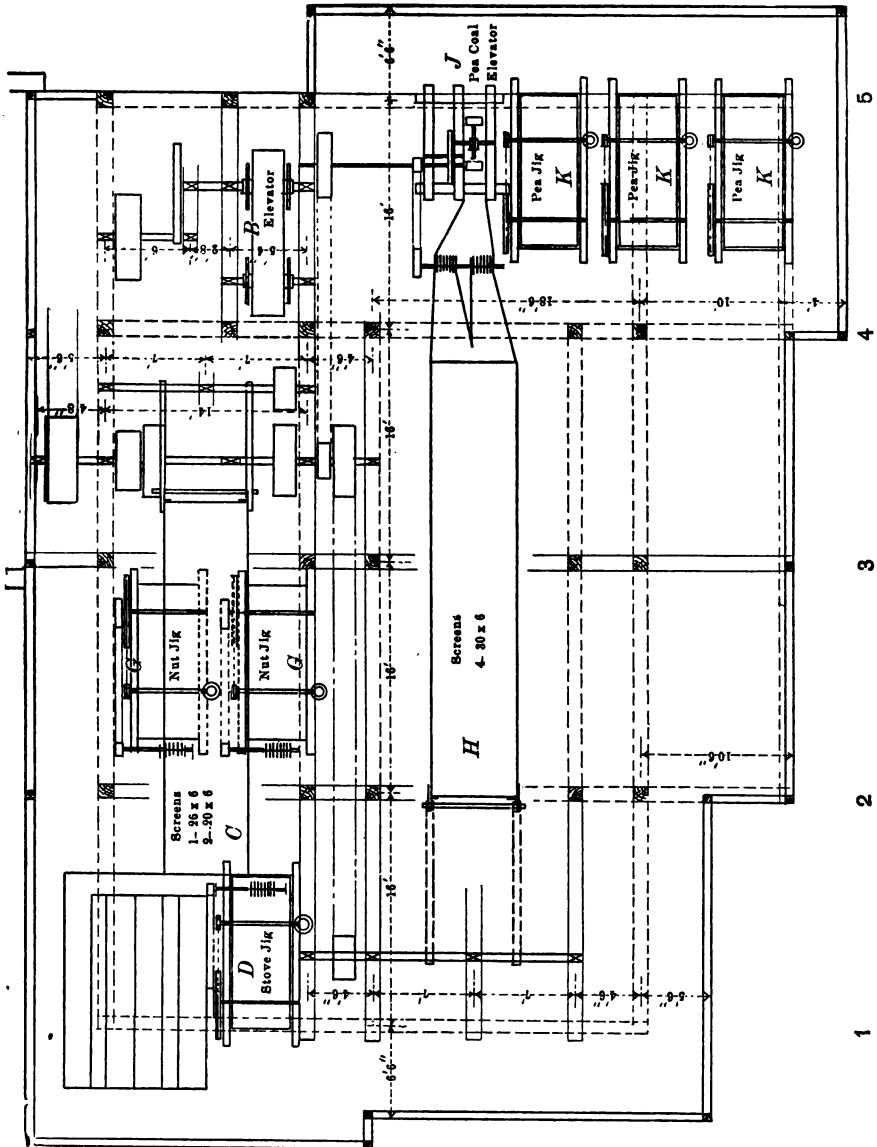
CAPOUSE WASHERY—PLAN, SHOWING THE POSITION OF THE MACHINERY.
